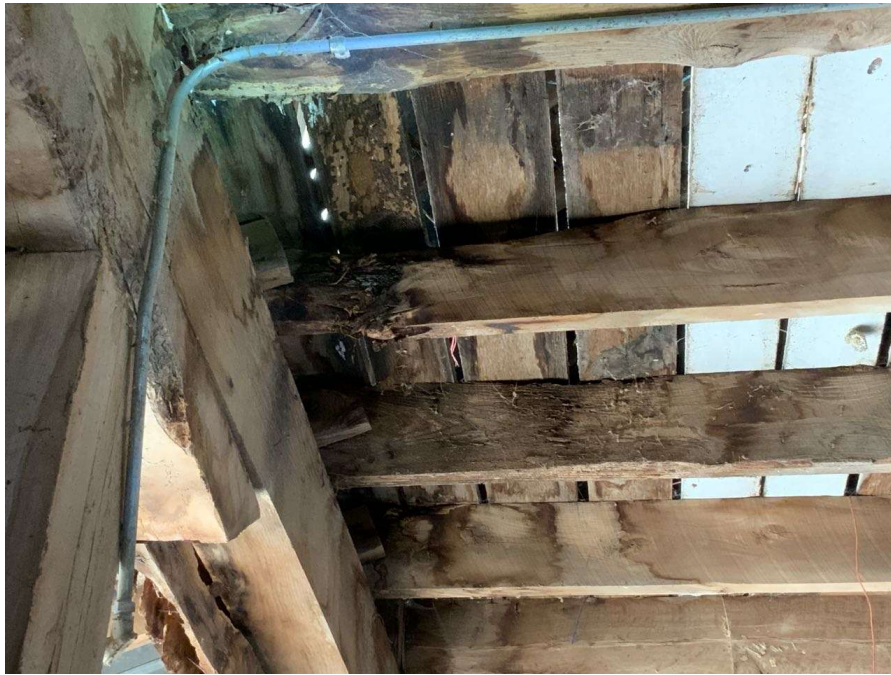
Rotting floor stringer bearing on floor beam spanning between Column R/4 and S/4 (looking west).
